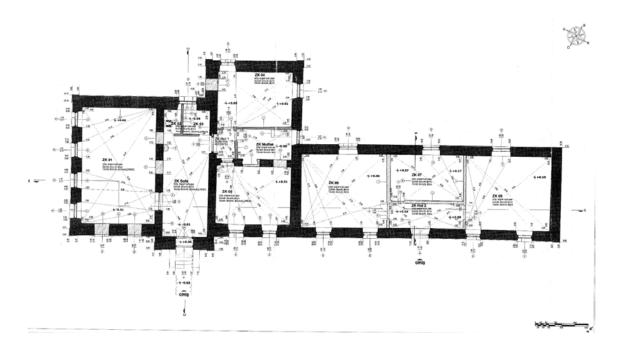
Building survey plan of Bardız Primary School.(Source: Yıldız Technical University Faculty of Architecture Restoration Project Group, 2007)
